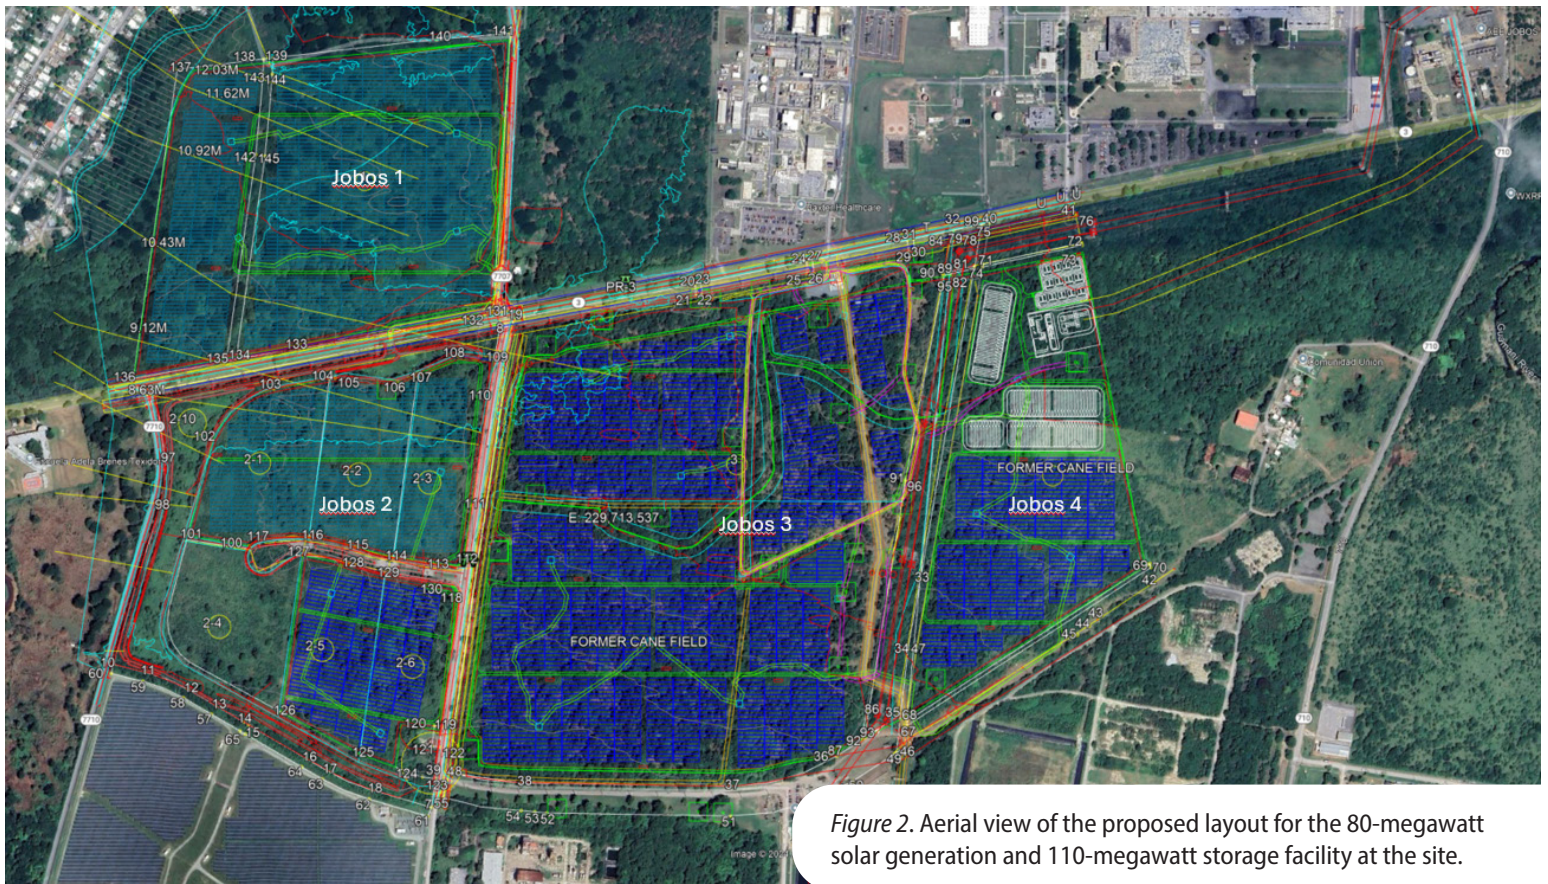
Aerial view of the proposed layout for the 80-megawatt solar generation and 110-megawatt storage facility at the site.
